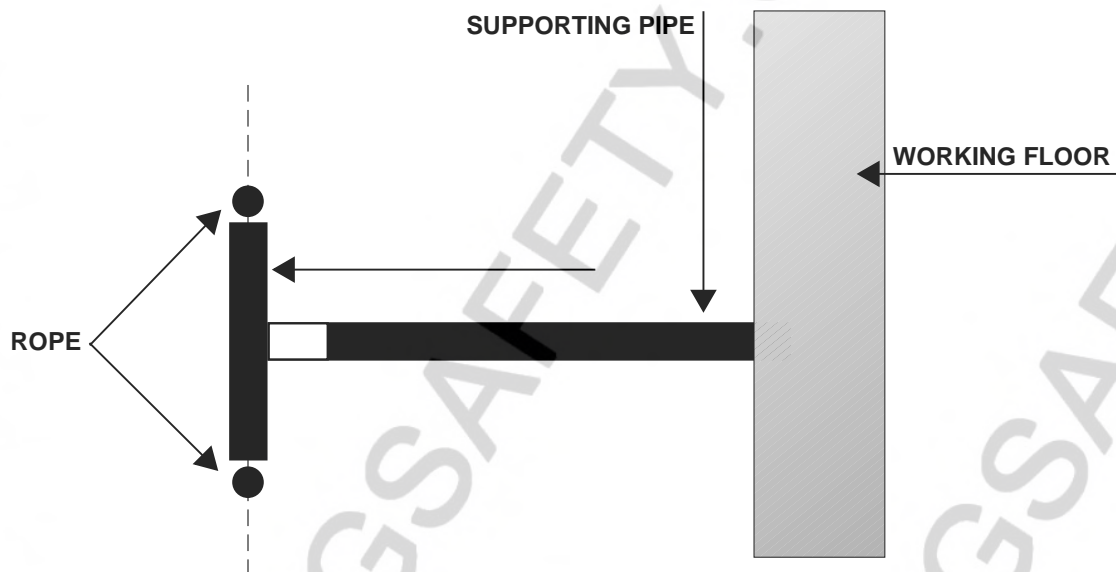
scheme in plant of SAFETYPULLEY® orienting for loads handling
